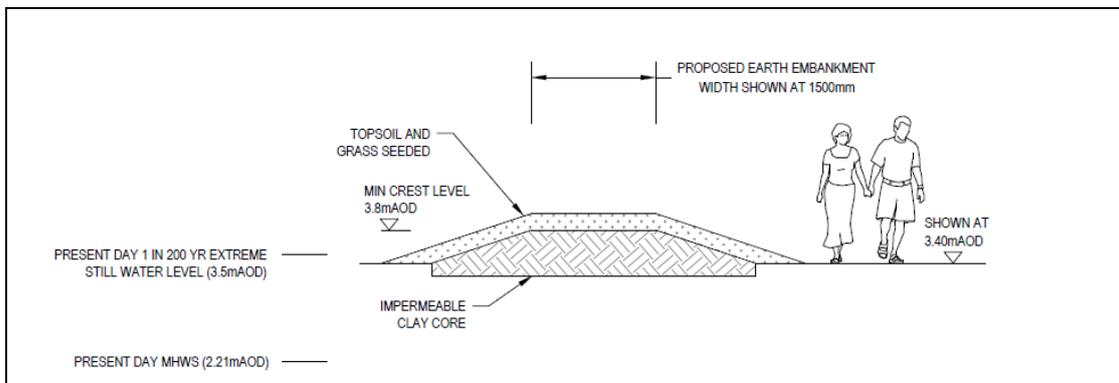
Sketch of indicative earth embankment section (through field) not to scale
